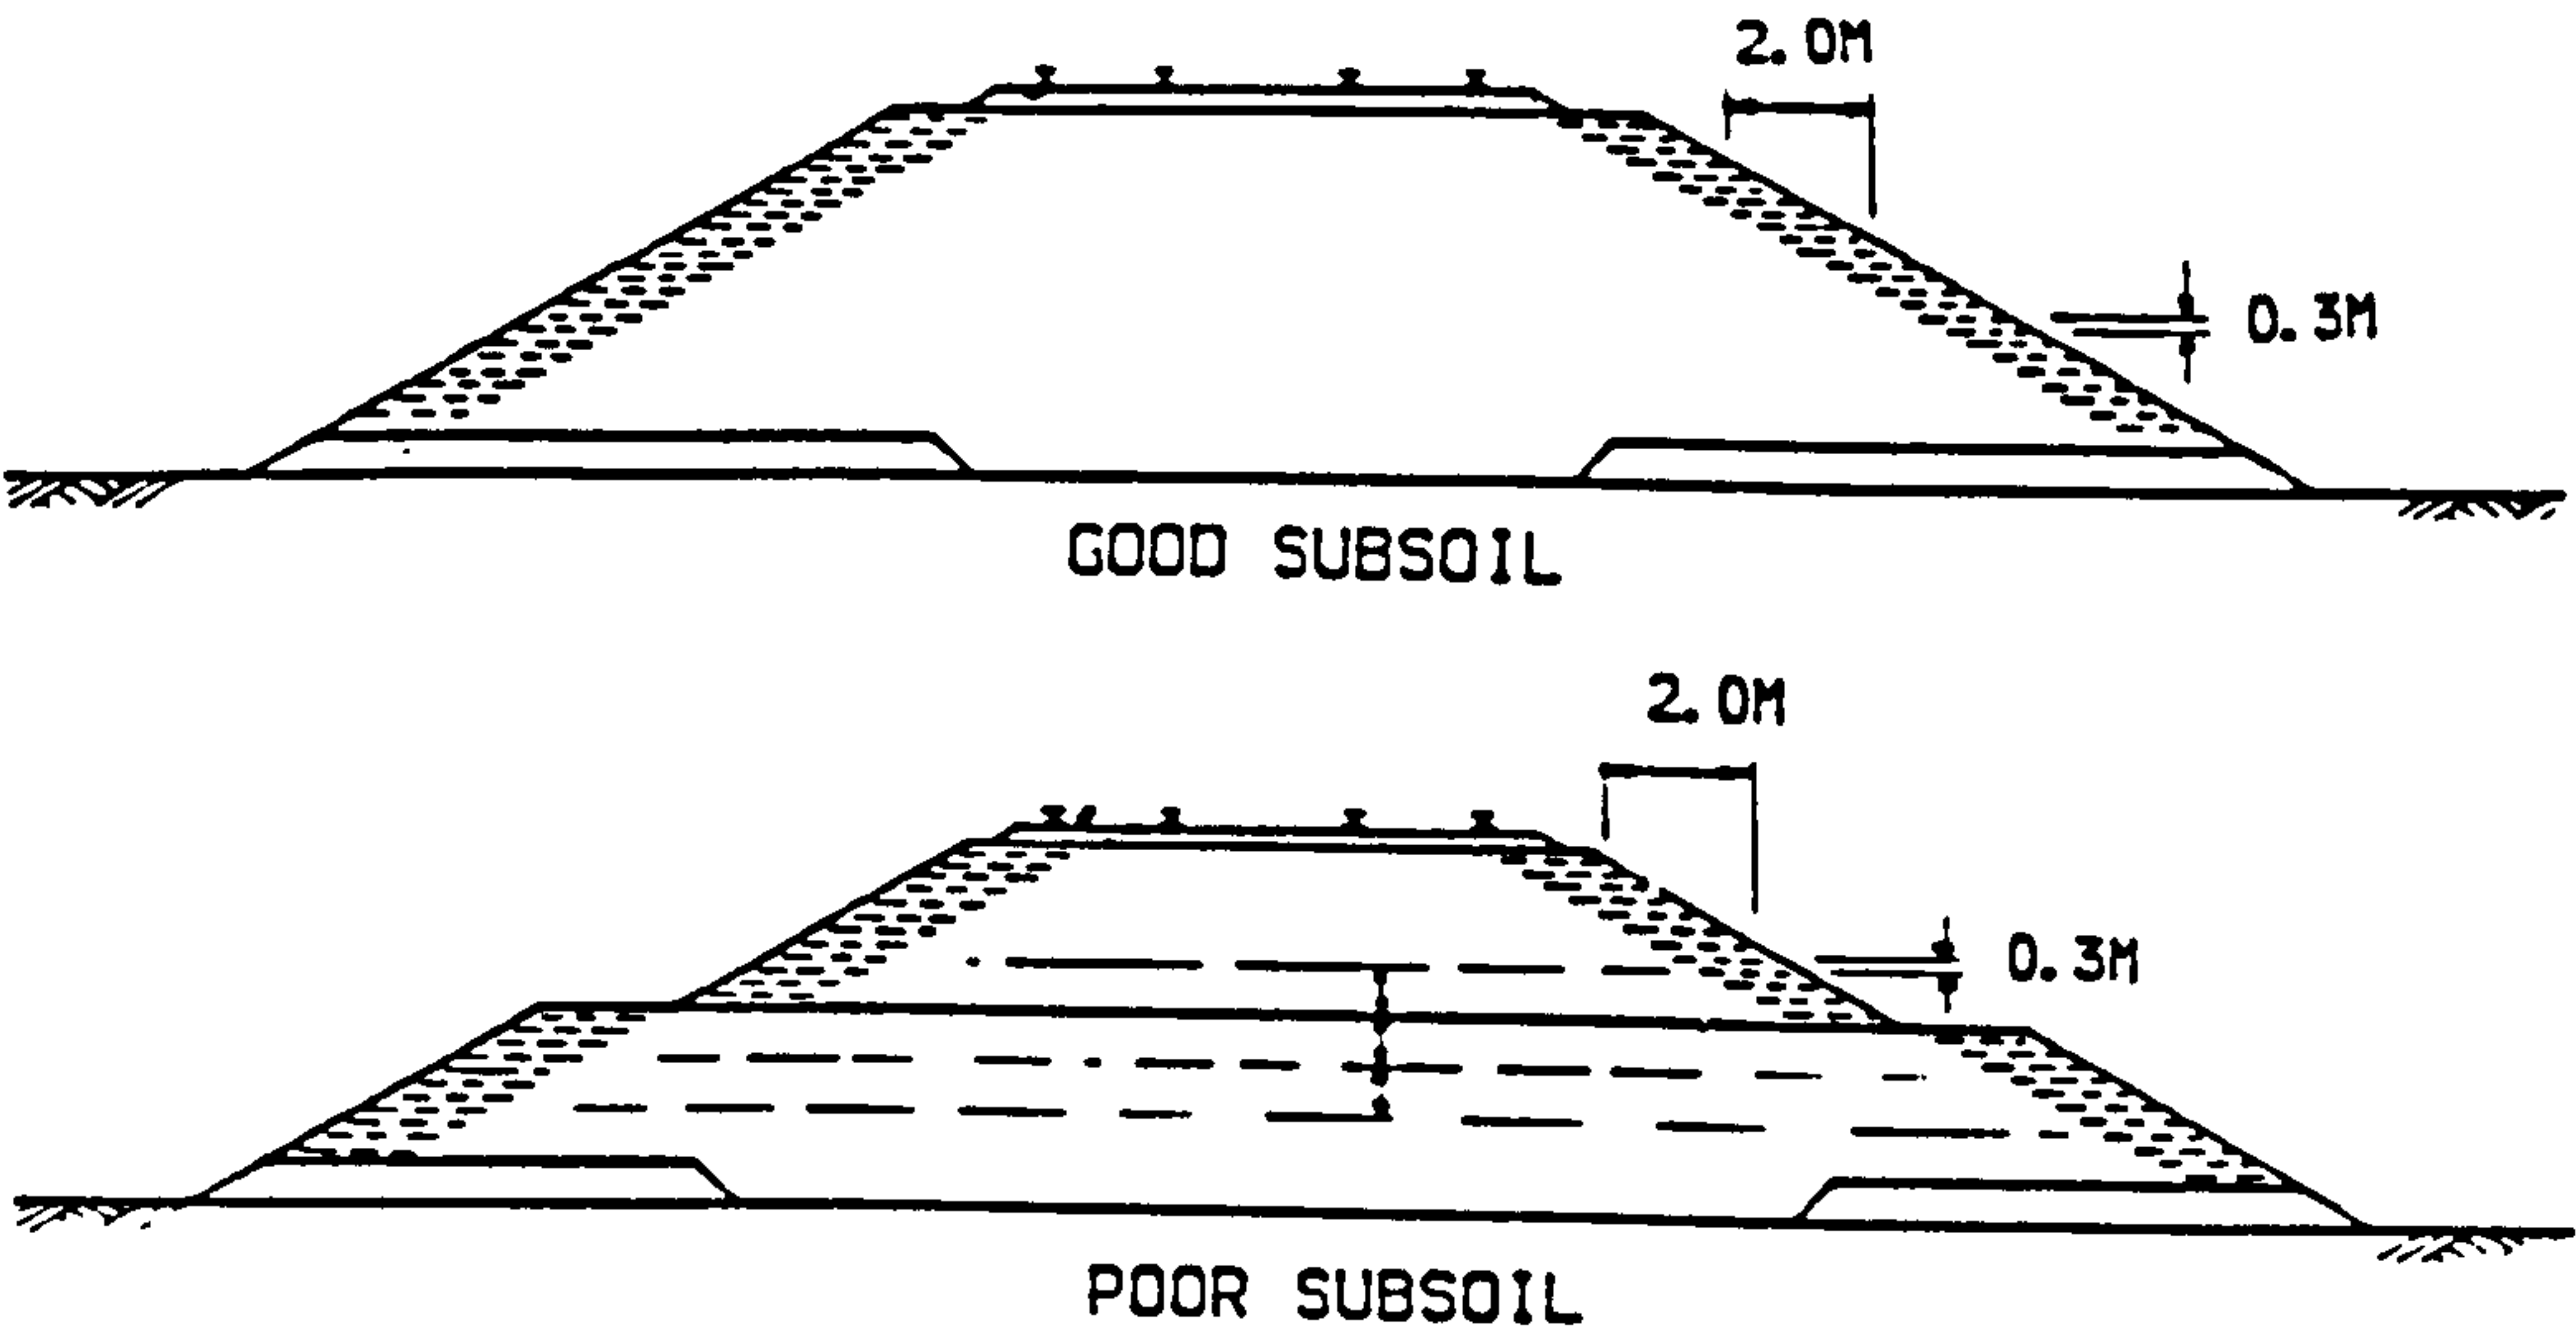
B) RAILWAY REINFORCED EMBANKMENT IN JAPAN (AFTER UEZAWA ET AL. , 1975).
